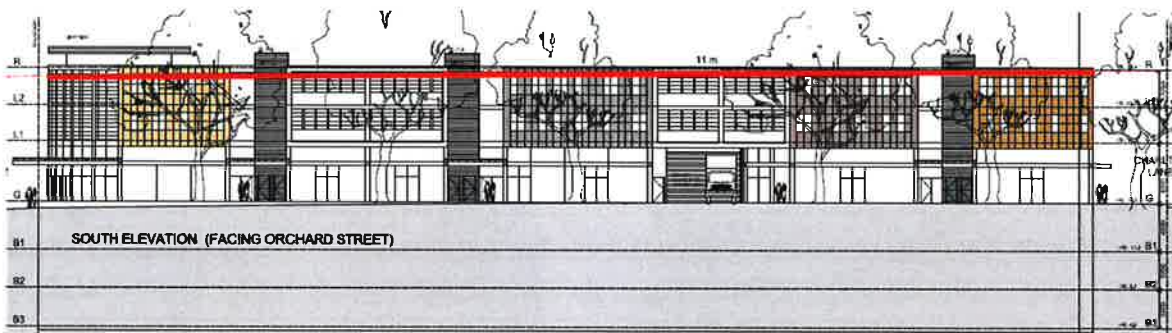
Plan extract showing extent of 11 metre building height breach southern façade
